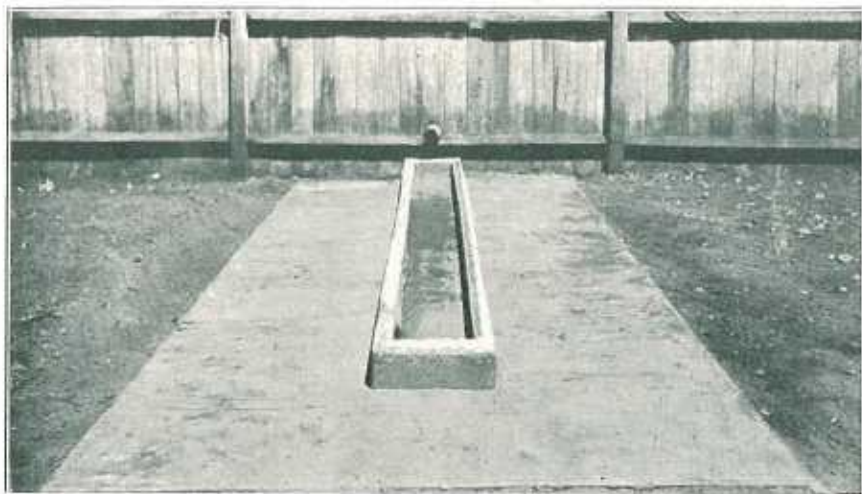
CONCRETE FEEDING TROUGH FOR PIGS AT THE STATE FARM, WARREN.
